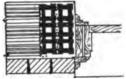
Section Through Door Jamb Showing Use of Closure Tile in Connection with Brick-faced Hollow Tile Wall
